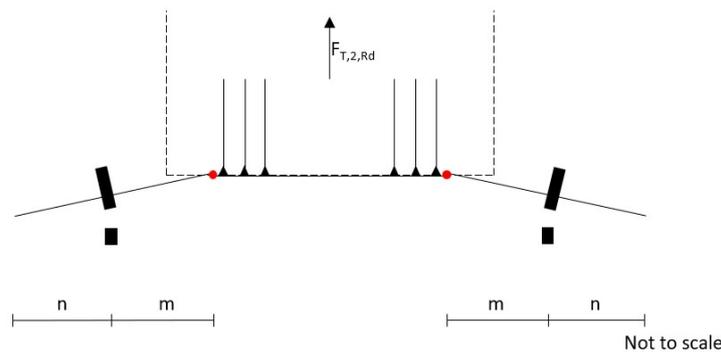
Mode 2: Bolt failure with yielding of the flange
